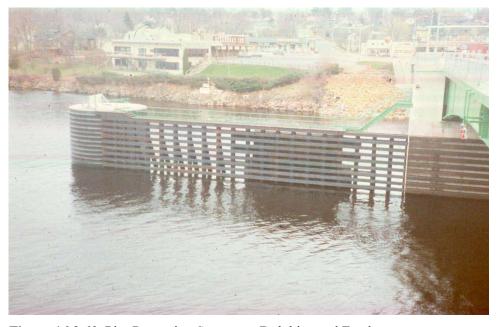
Pier Protection Systems – Dolphins and Fenders
